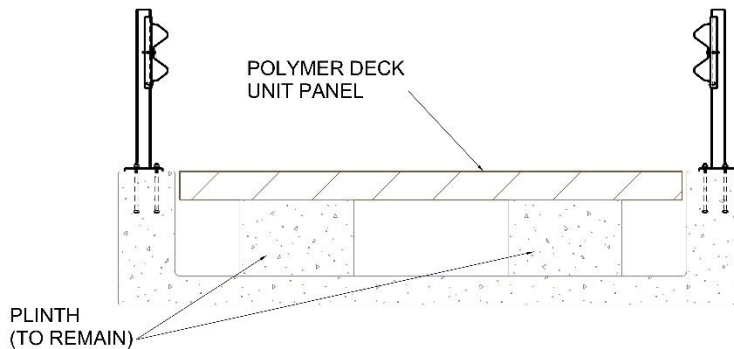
Potential Retrofit Single Direction Deck System
